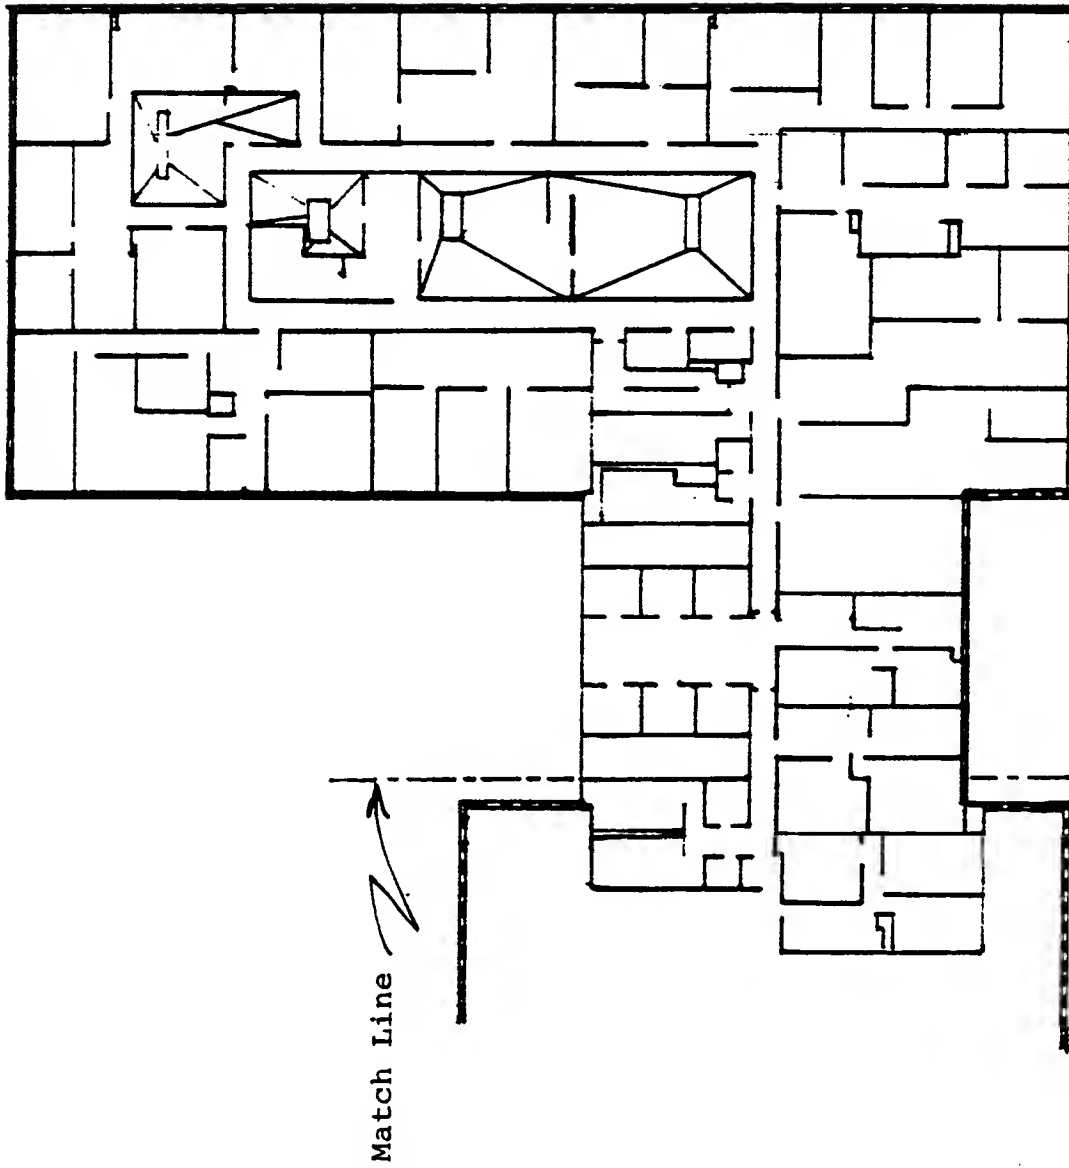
USIA BUILDING FOURTH FLOOR NORTH
